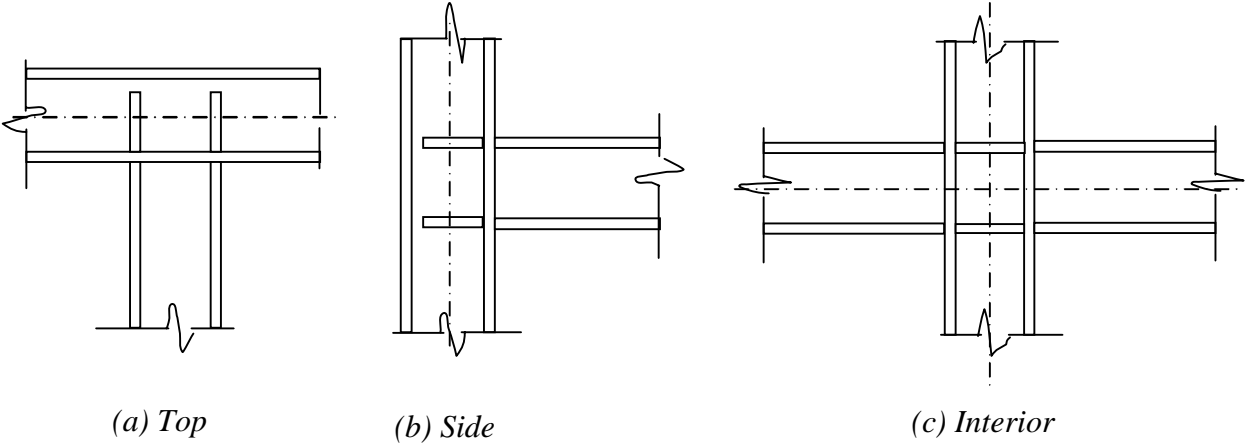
Beam to column connections of (a) Top, (b) Side, and (c) Interior Type
